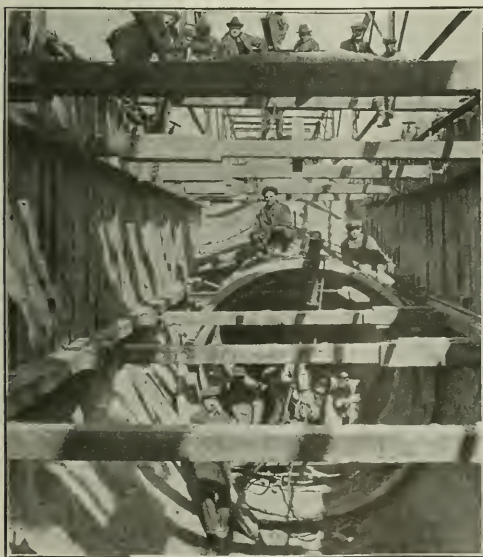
SEWER OF 84-IN. CONCRETE PIPE IN TRENCH
